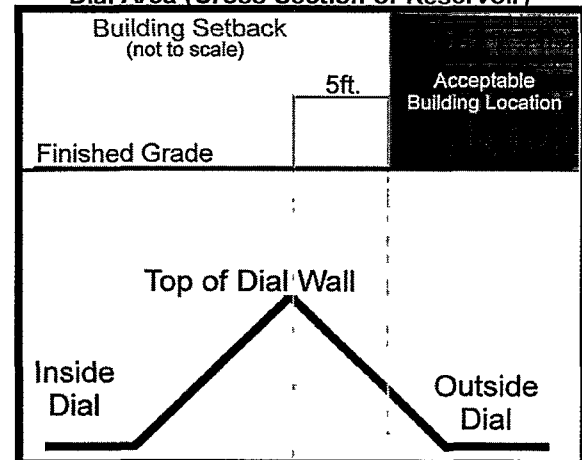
Required Building Setback Near Dial Area (Cross Section of Reservoir)
